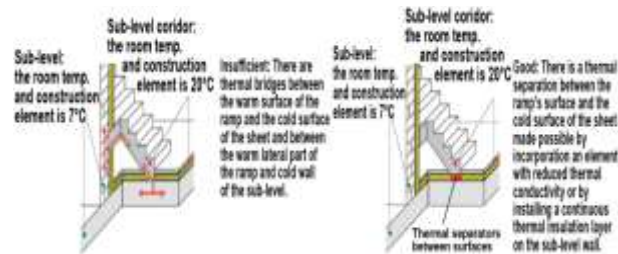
Thermal bridges at the joints between stair ramps and thermal separation walls or sheets layered on the soil
